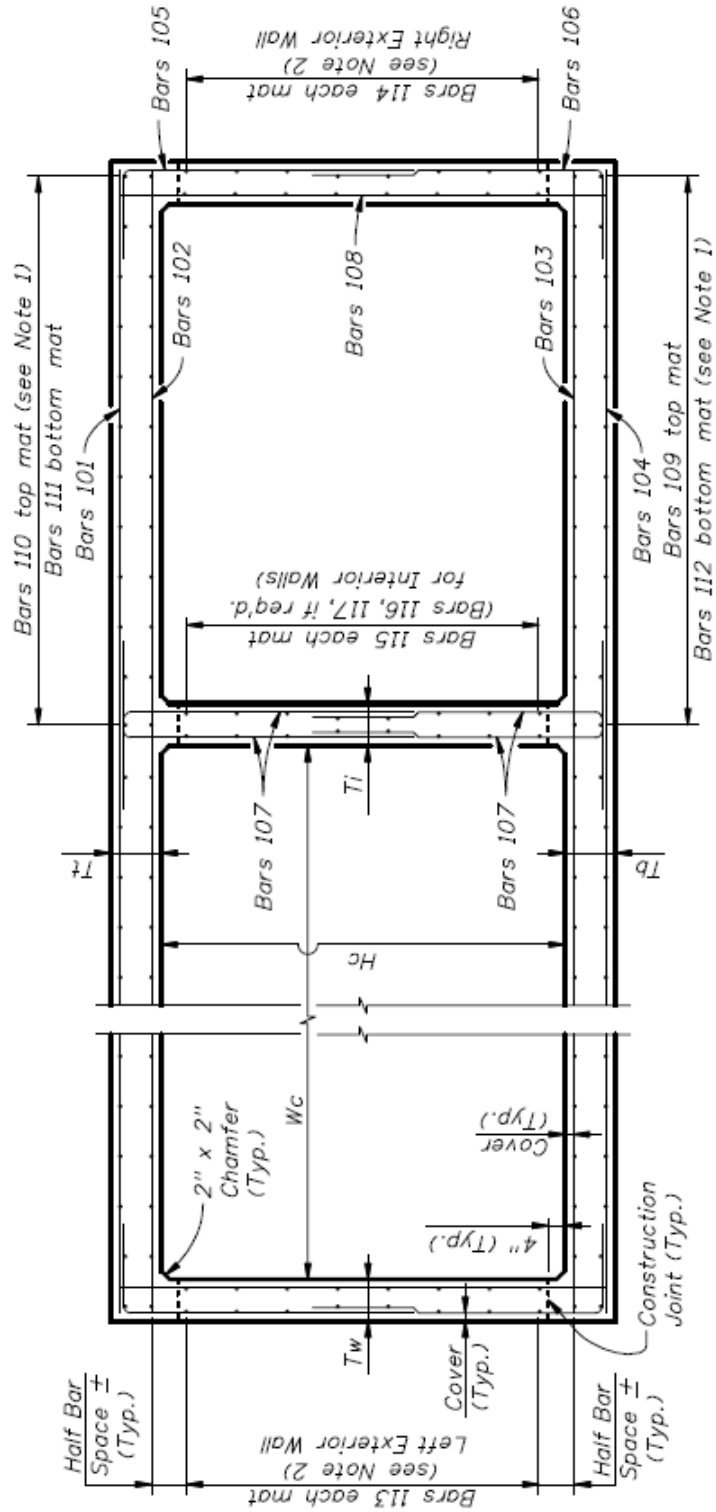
Typical FDOT Double Barrel Cast-in-Place Box Culvert Cross Section (FDOT
